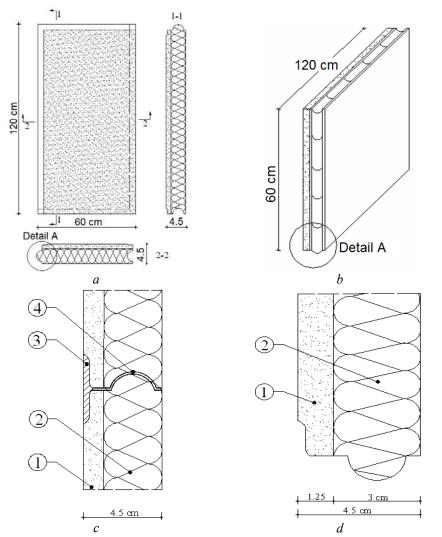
a – Prefabricated two-layer panel; b – perspective view of prefabricated two-layer panel; c – tongue and groove joint detail; d – end detail of prefabricated two-layer panel.
